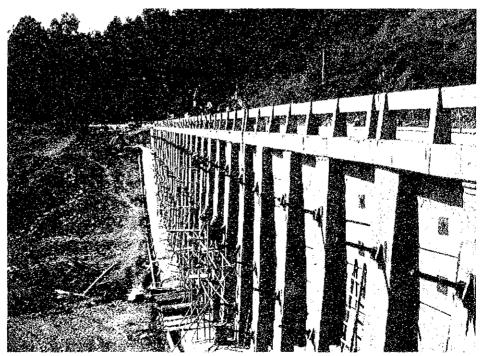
Reinforced Concrete Crib with Ground Anchor
